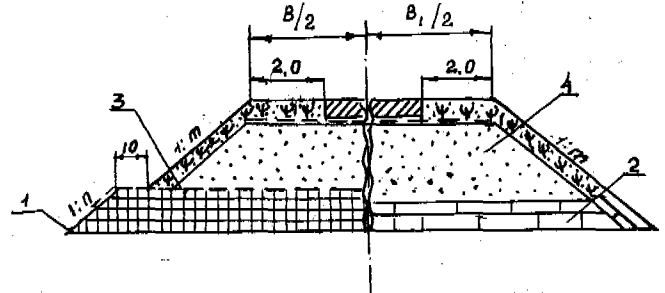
Structure of the embankment with heat-insulating layers in its foundation: 1- peat; 2- plastic foam; 3- geotextile; 4- sand
